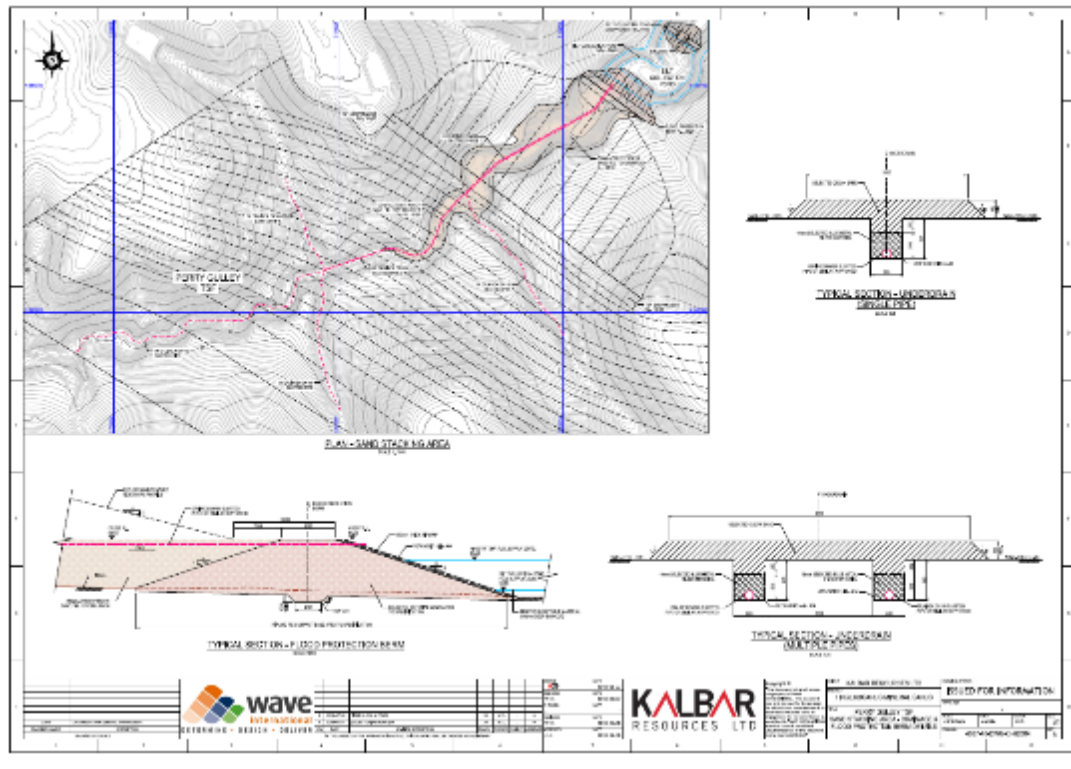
TD 119 Sand Staking Drainage and Flood Protection
